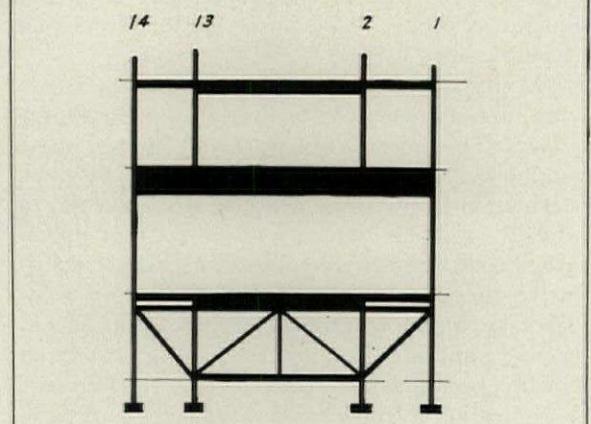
The large girder and the inverted truss were necessary to accommodate the wide show front shown at the upper left corner of this page
